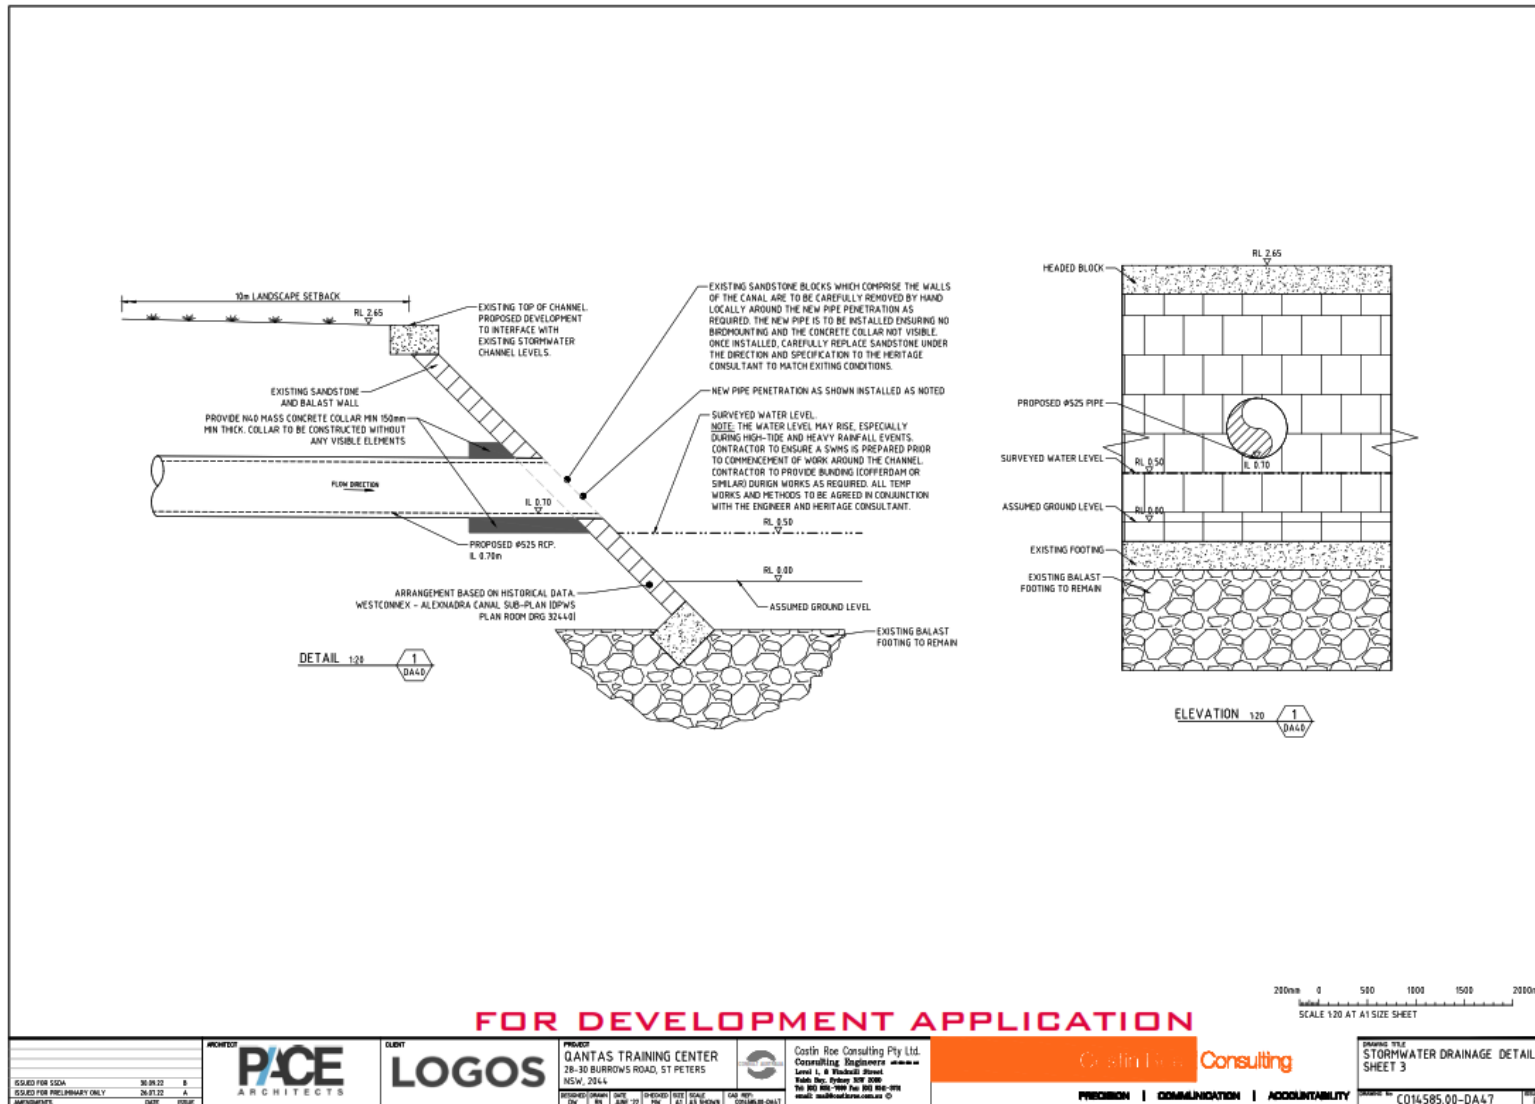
Section and Elevation of new stormwater outlet into Alexandra Canal, 28-30 Burrows Road. (Source: LOGOS, 2022)
